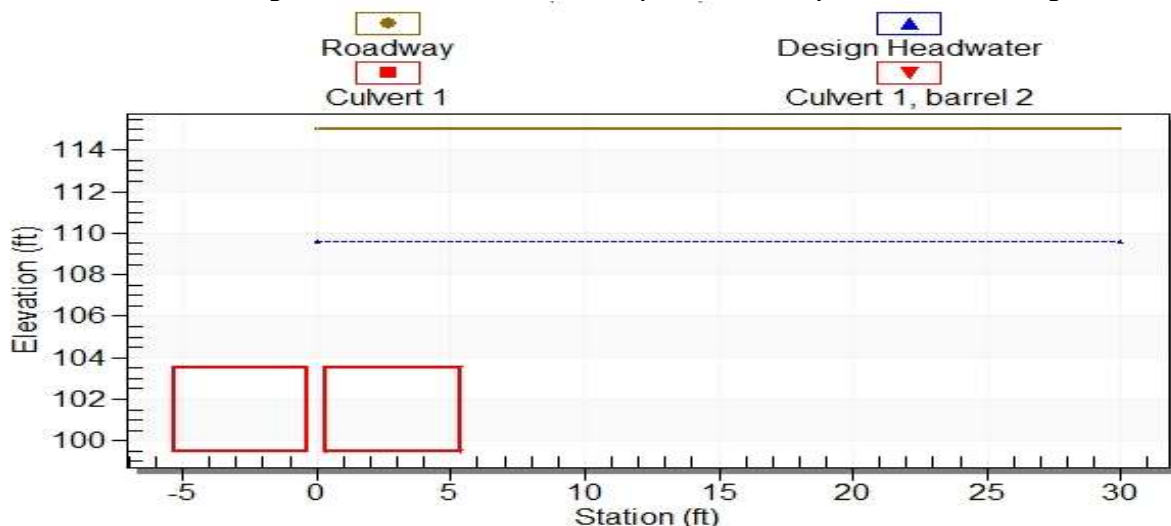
Crossing Front View (Roadway Profile): Box Culvert (5ft x 4ft) Two Barrels
